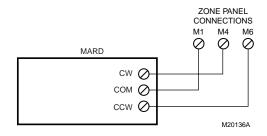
Wiring MARD Damper or ML6161 Actuator to panel.
